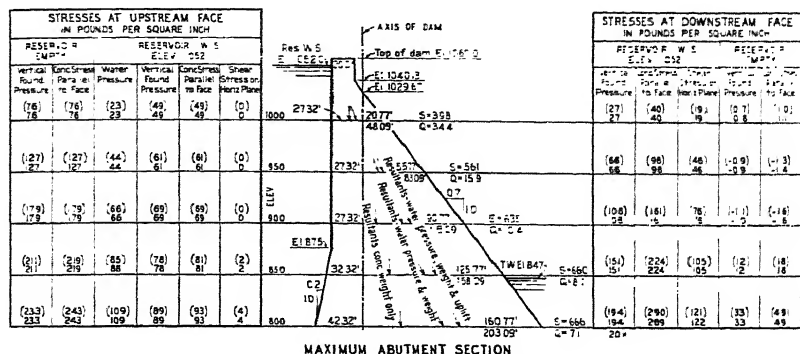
shows that the maximum sliding factor at the abutment sections of the dam for this condition of reservoir loading, assuming the full water load carried by gravity action, occurs at the base of the maximum section, elevation 800, and amounts to 0.666. The shear-friction factor of safety at the same elevation amounts to 7.1, the minimum value for any elevation in the abutment section. The maximum compressive stress occurs at the downstream face of the dam at elevation 800 and amounts to 194 pounds per square inch vertical pressure or 289 pounds per square inch inclined stress parallel to face. The maximum shearing stress occurs at the same location and amounts to 122 pounds per square inch. No tension occurs at any location during this condition of loading. Vertical compressive stresses at the upstream face of the dam are greater than the unit water pressure at elevations above 900 and only slightly lower than the water pressures at elevations below 900.
